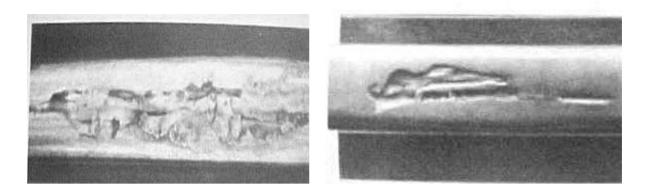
1211 OR 2211 - HEAD, SURFACE, SHALLOW SURFACE DEFECT (FLAKING)
